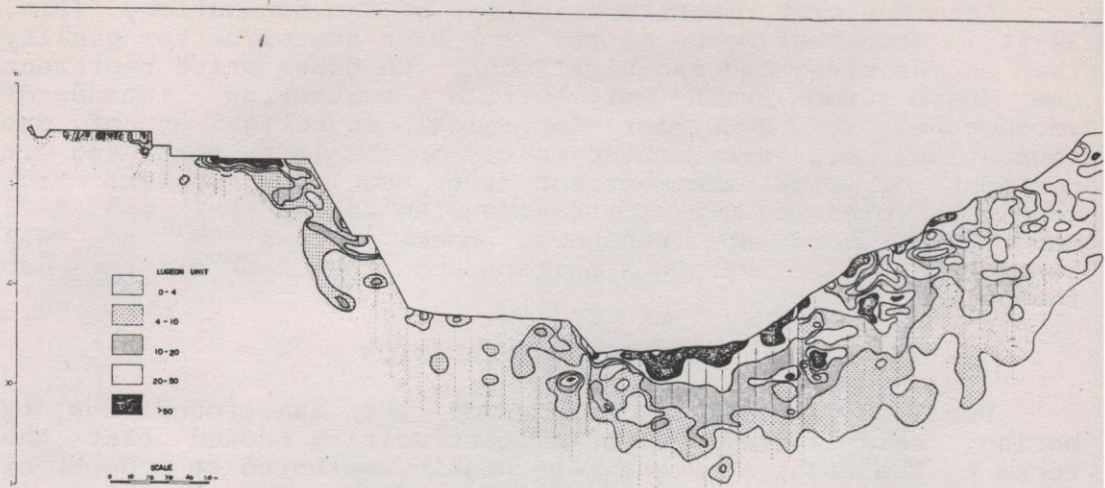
Permeability Profile of Main Dam Curtain Grouting, Primary Holes
